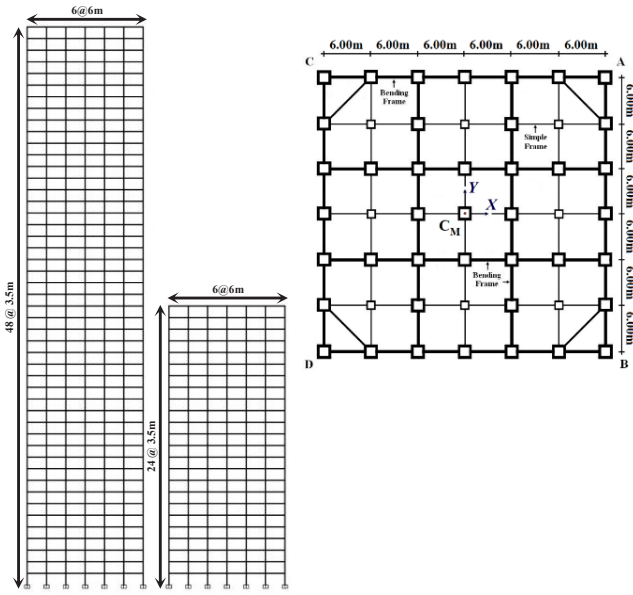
Plan and elevation of the 24 and 48-story studied bundled tube structures
